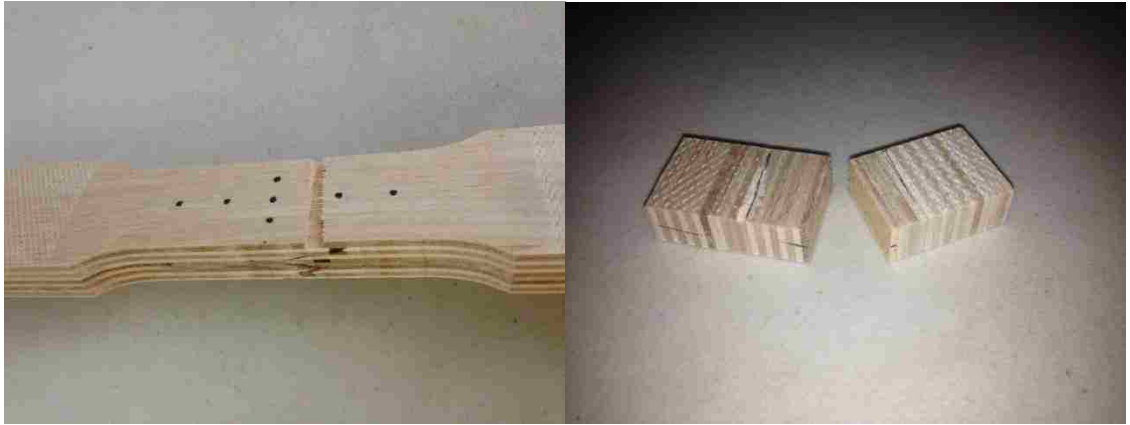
Figure H. Failed Specimen in Tensile Parallel Test (Left), Perpendicular Test (Right).
